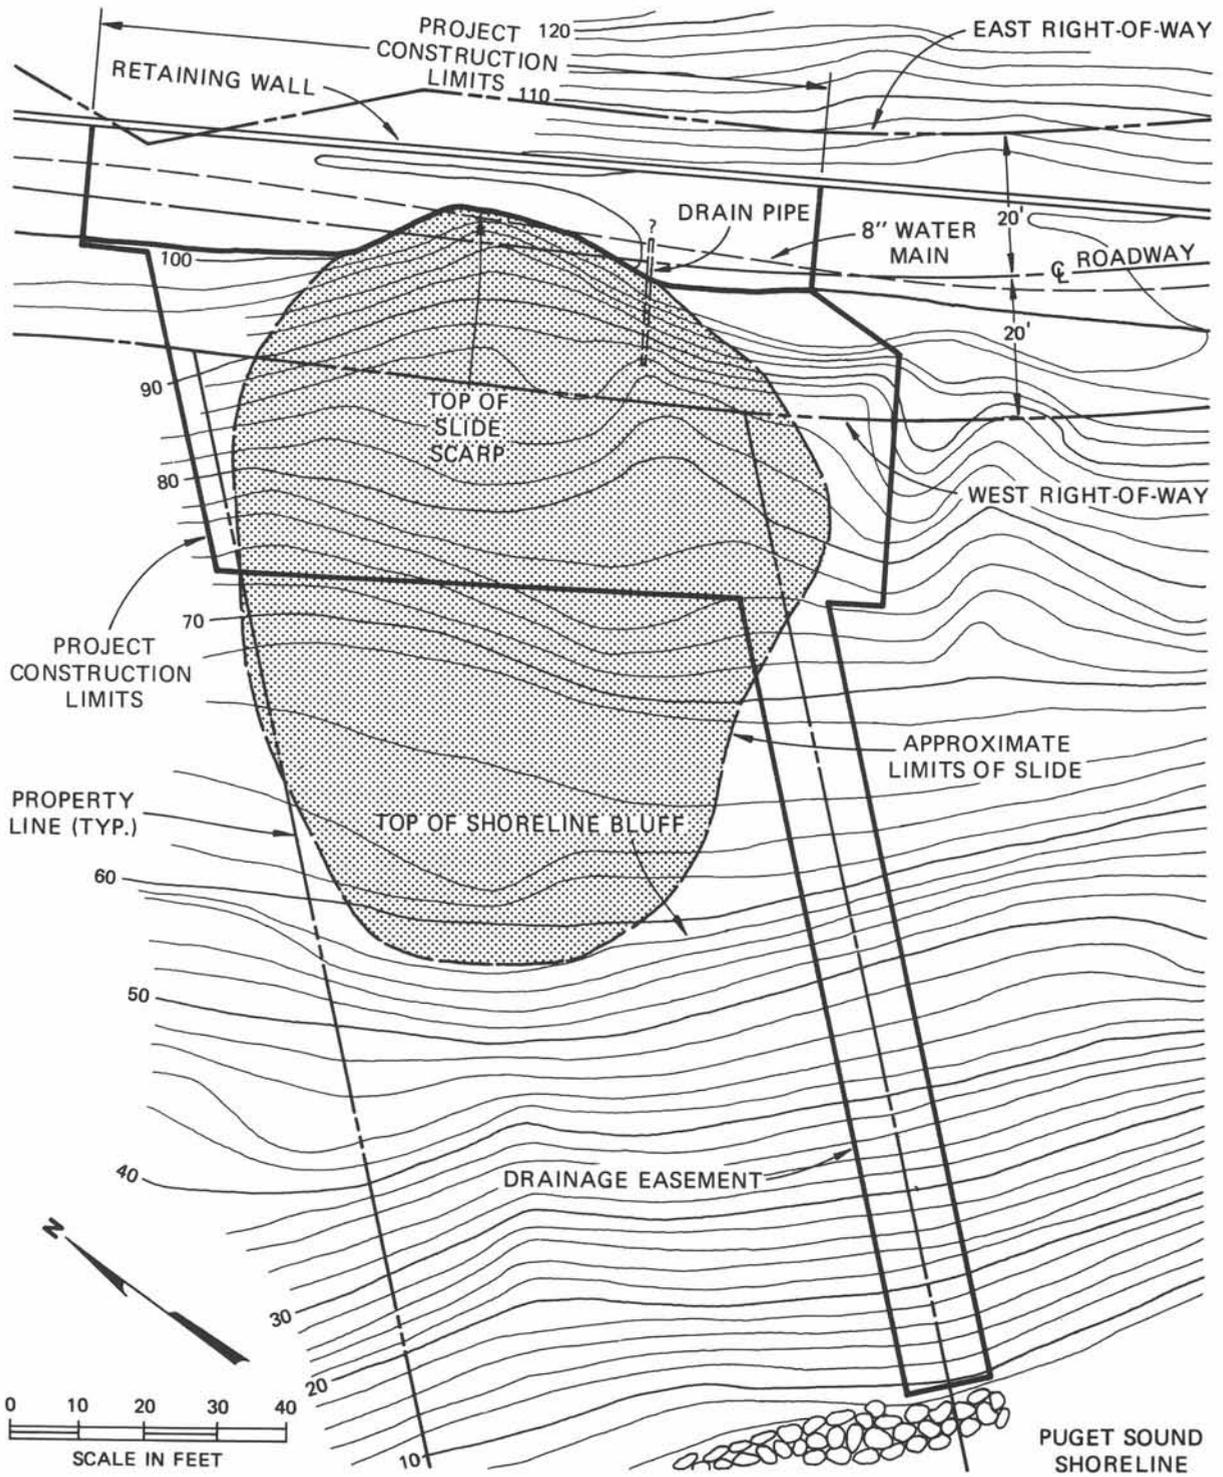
Site plan, including project construction limits and the top of the slide scarp.
